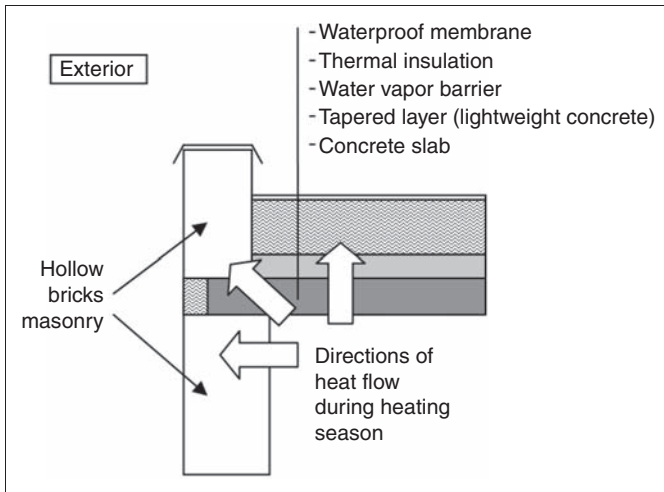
Typical example of a thermal bridge with a considerable vertical heat flow (wall–roof connection).
